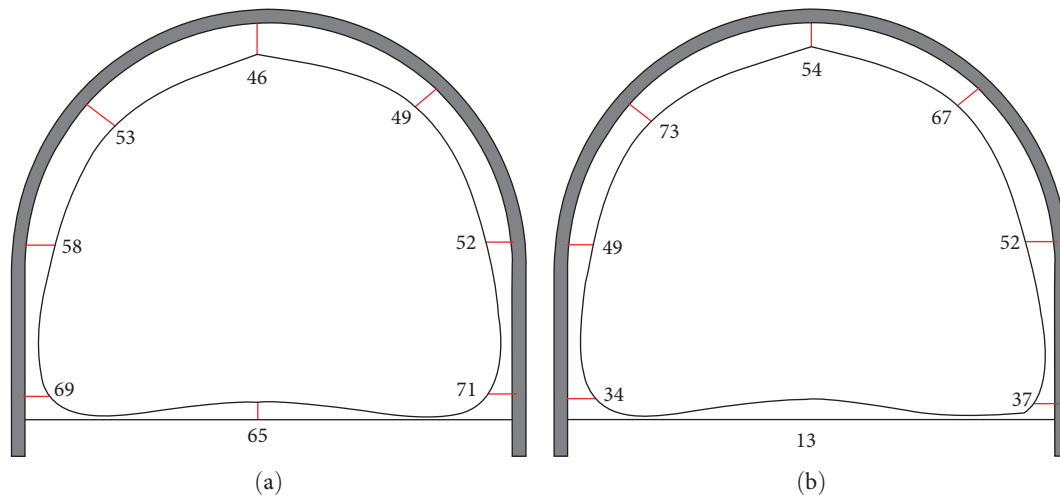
Roadway final shape of working conditions (a) C1 and (b) C6.
